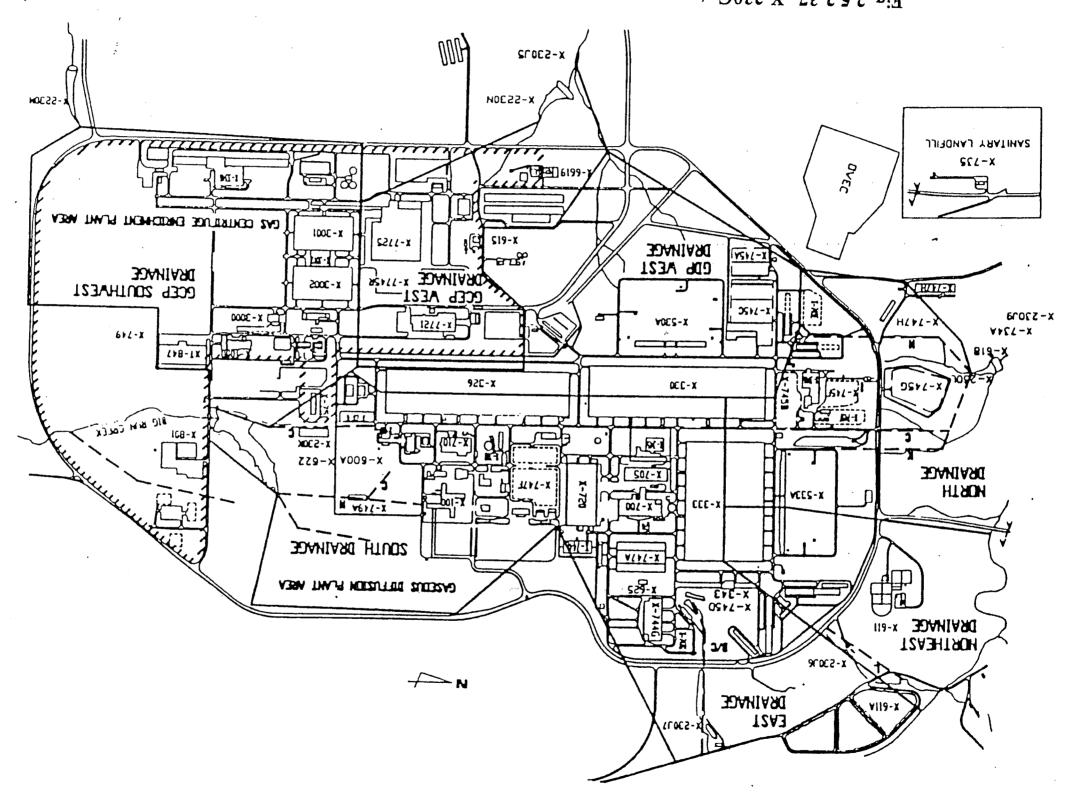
X-230C storm sewer system showing plant drainage and containment sectors.
